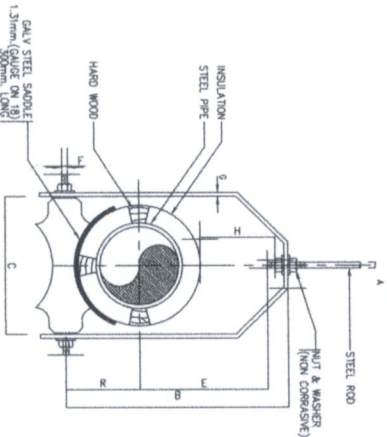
## DETAIL OF BRANCH LINE SPRINKLER PIPE SIZE
